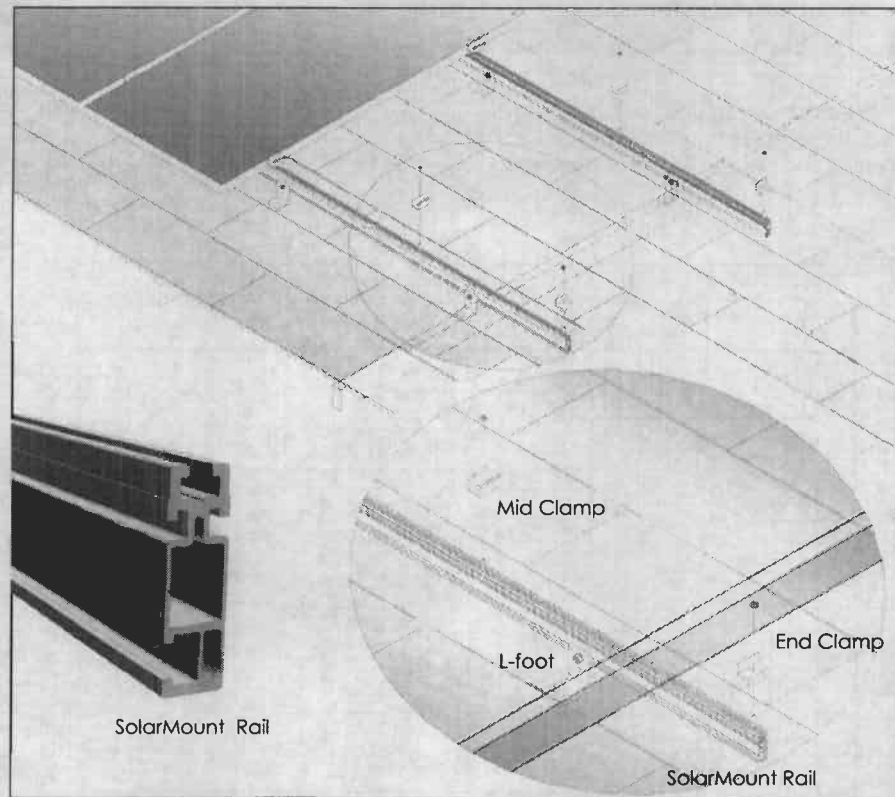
Exploded view of a flushmount installation mounted with L-feet.
